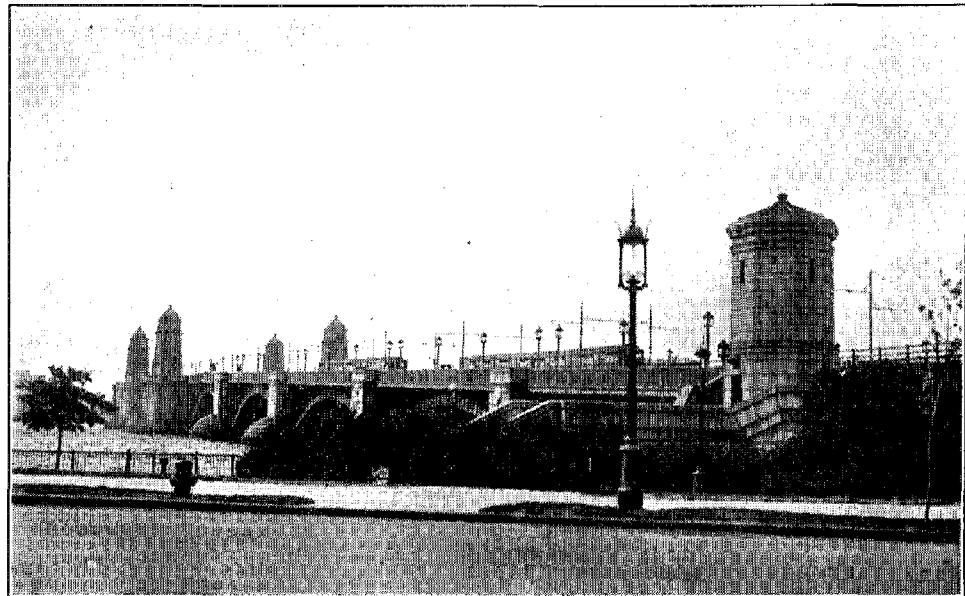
Cambridge Bridge over the Charles River—Boston Elevated Railway.
